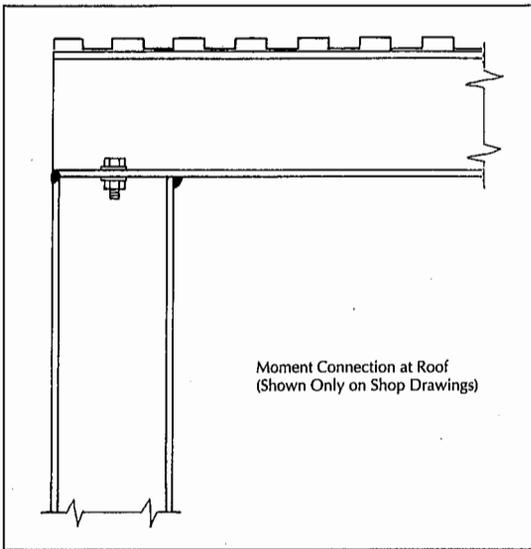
No stiffener plates were provided at the connection to transfer moment.
